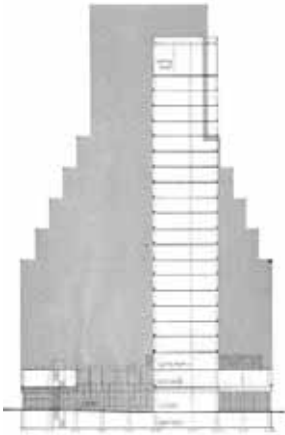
Lever House zoning diagram. Source: Architectural Forum, June 1952
